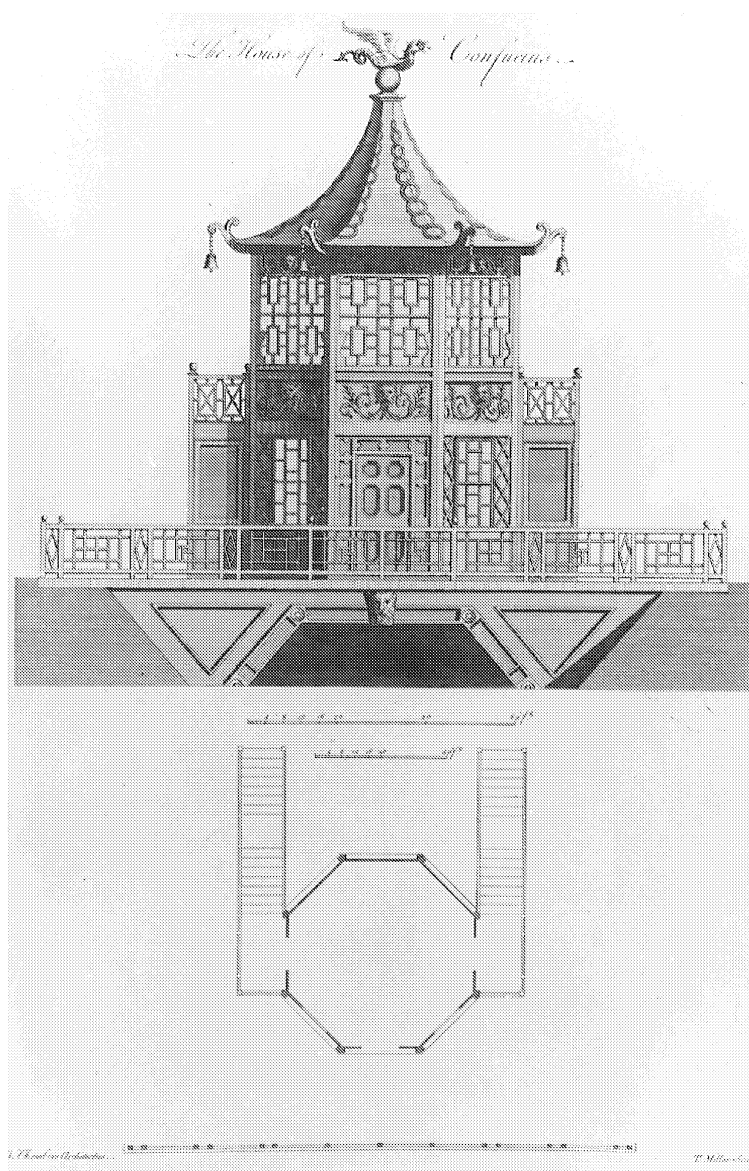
“The House of Confucius.” William Chambers, *Plans, Elevations, Sections, and Perspective Views of the Gardens and Buildings at Kew in Surry* (1763), pl. 15.
